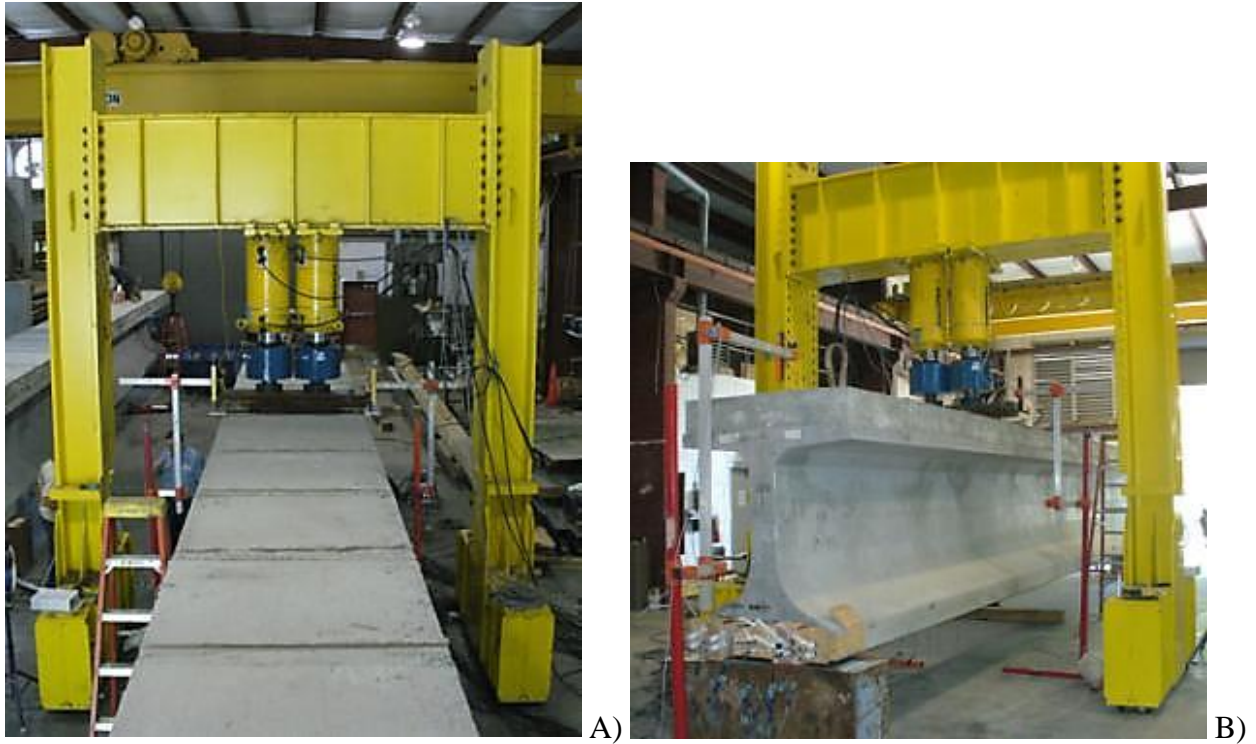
Test specimen and load frame view of A) top and B) side of girder
